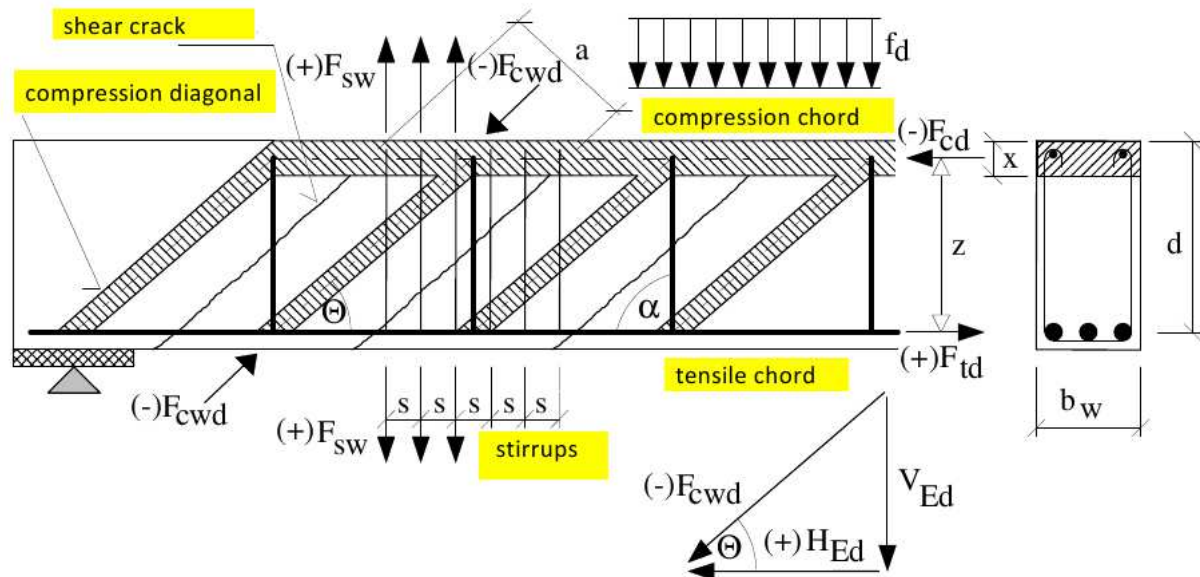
Truss model for the design of shear reinforcement. Distribution of the shear force V_{Ed} into $(-)F_{c wd}$ in the compression diagonal and the horizontal force $(+)H_{Ed}$ in the tensile chord
